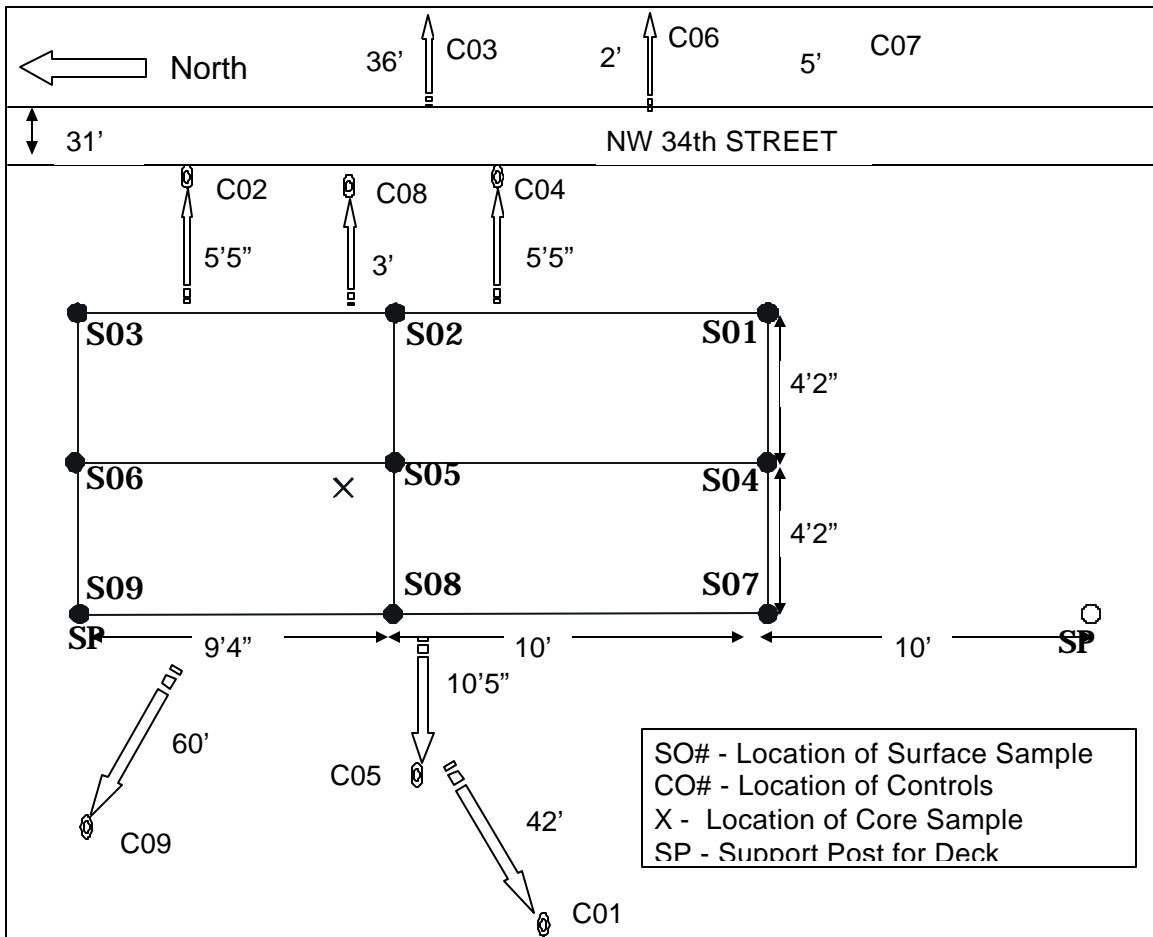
Sampling Locations for Deck at 34<sup>th</sup> Street Bridge, BR
